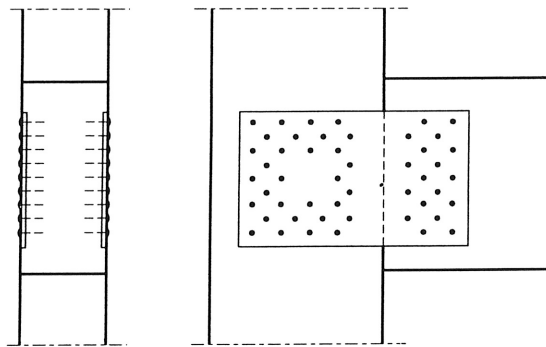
Nailed plywood or steel gusset plates. The joint is effective and easy to make. It may be necessary to protect the gusset plate against fire.
